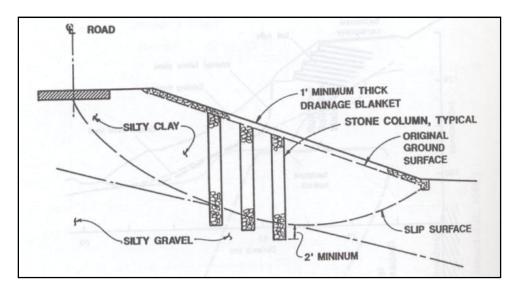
Stone columns to stabilize an unstable slope (Source: Abramson et al. 2002)
